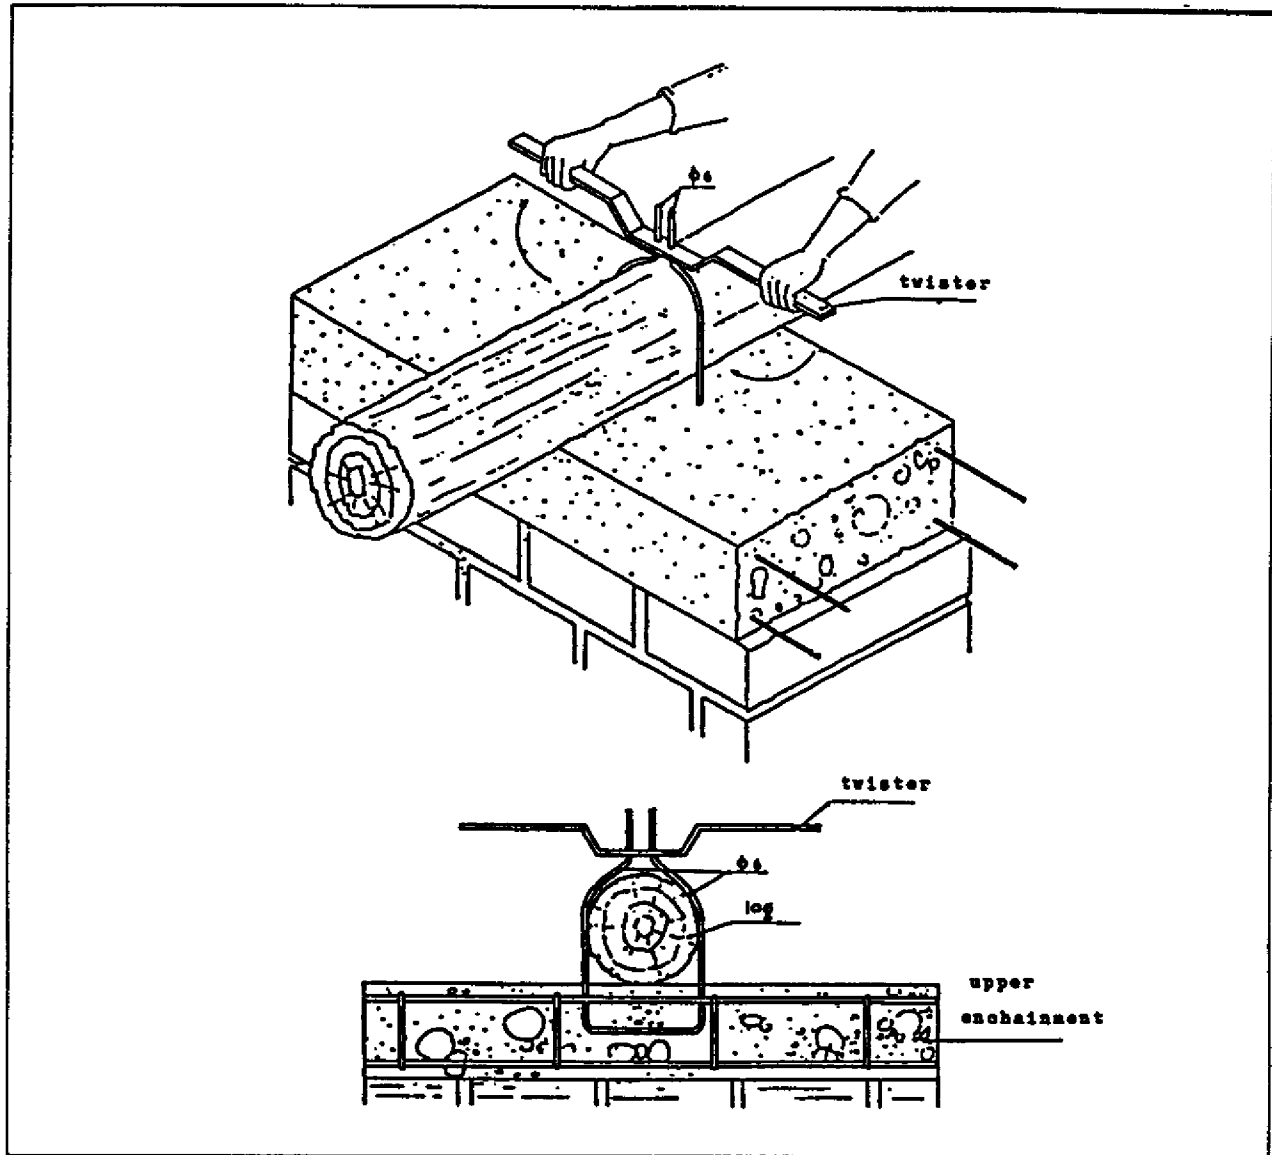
Anchoring of Roundwood to Concrete Wall Plate [14].
